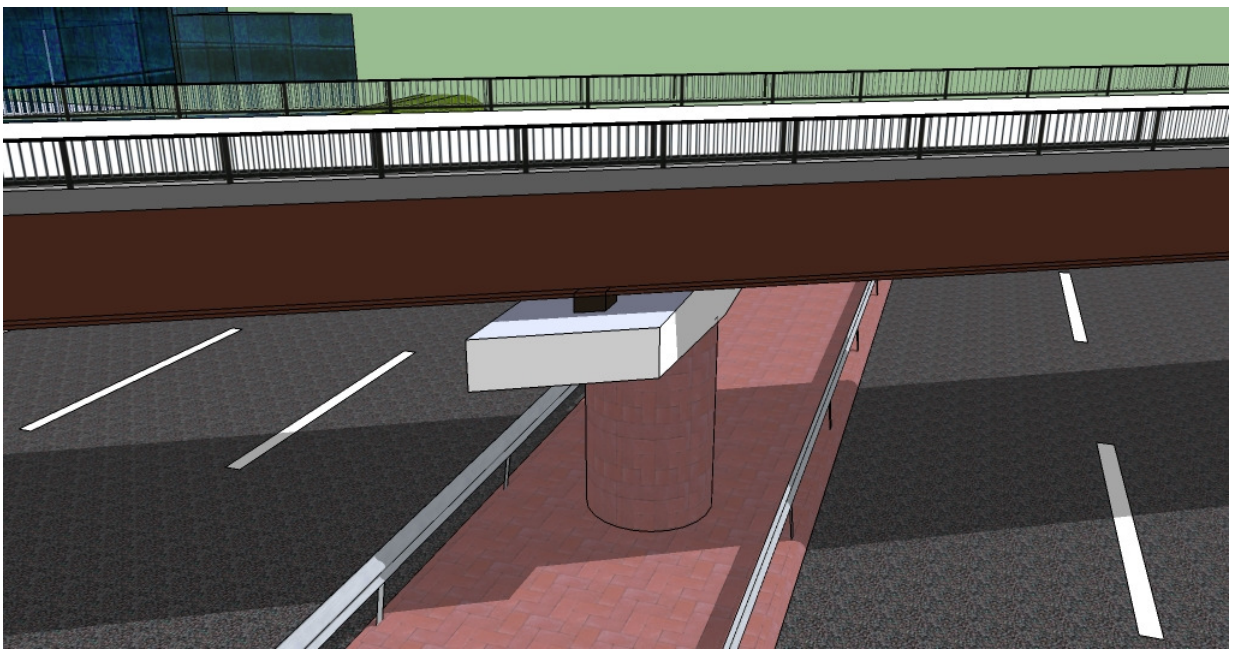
B: Three dimensional view of the bridge deck slab on steel girders, bearings and parapets
